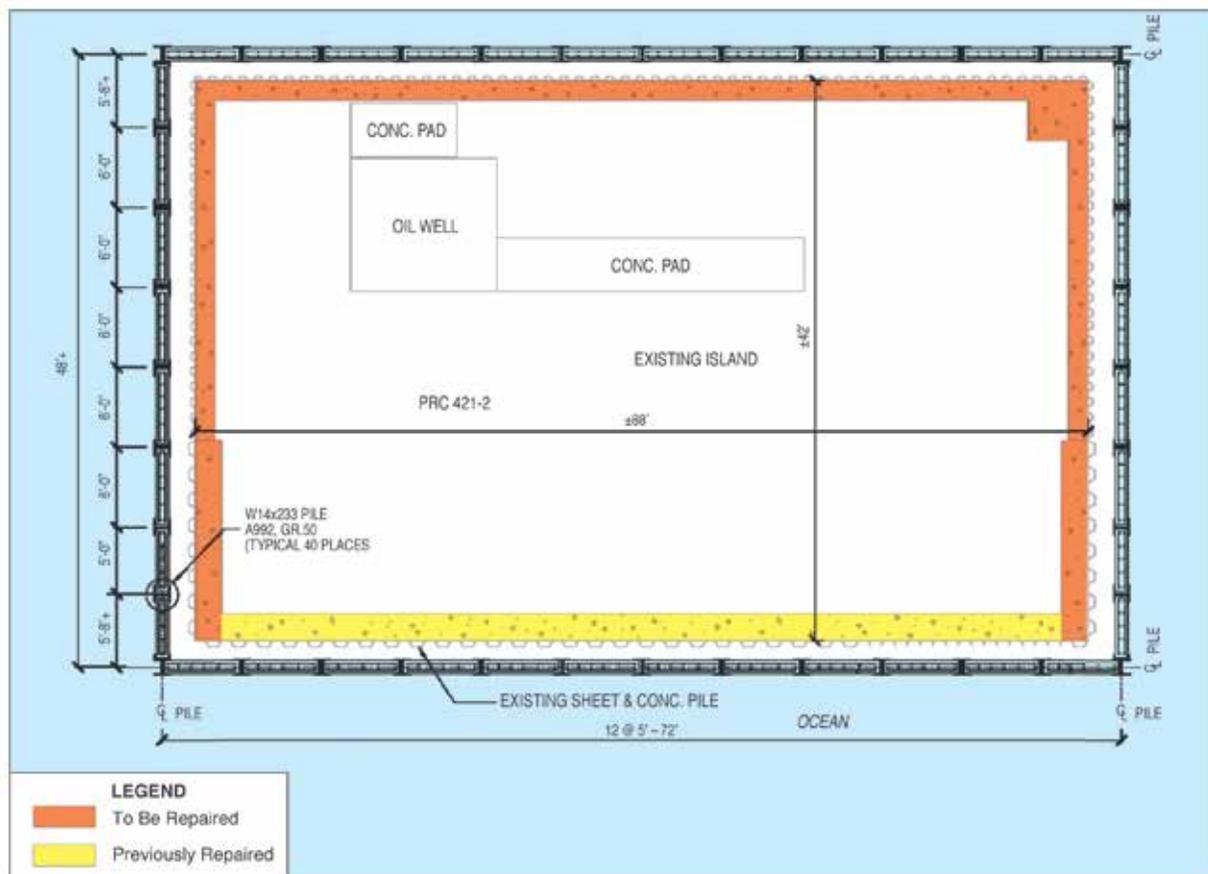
Proposed Caisson Repairs At Pier 421-2
